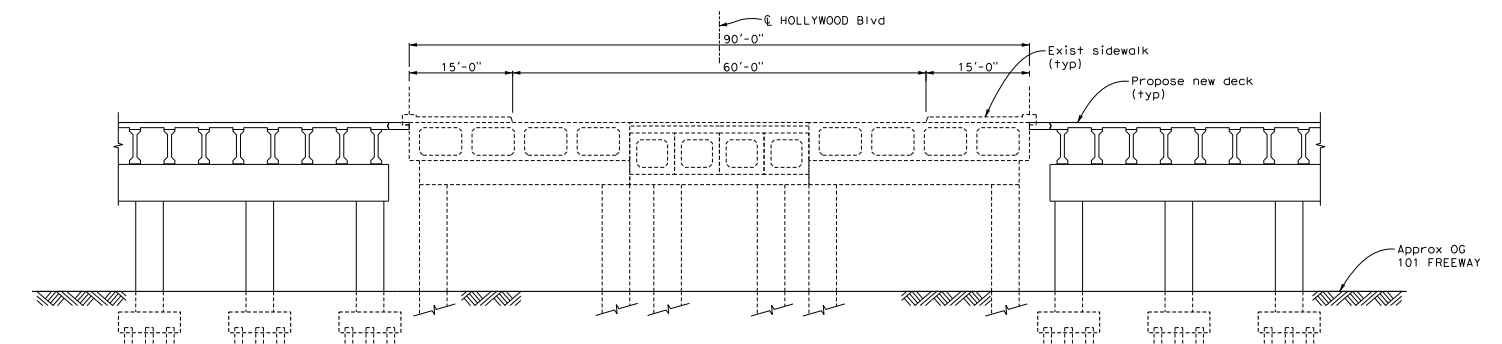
Typical Section G-G Showing the Configuration of the New Park Structure with Existing Hollywood Boulevard Overcrossing
